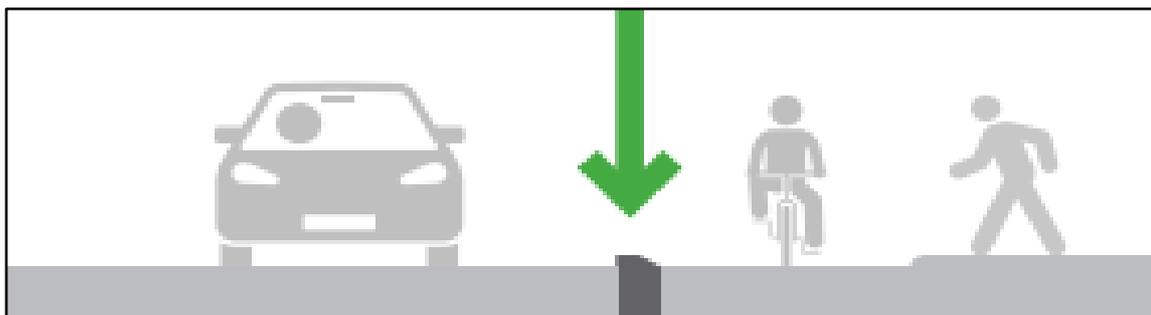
Image Showing the Raised Concrete Separator Kerb Proposed Along the Goatstown Road
